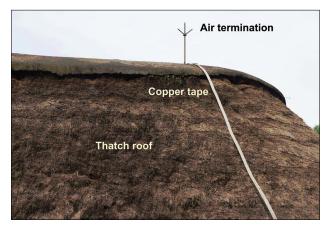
Thatch roof structure showing the down conductor of a lightning protection system resting on the roof.
